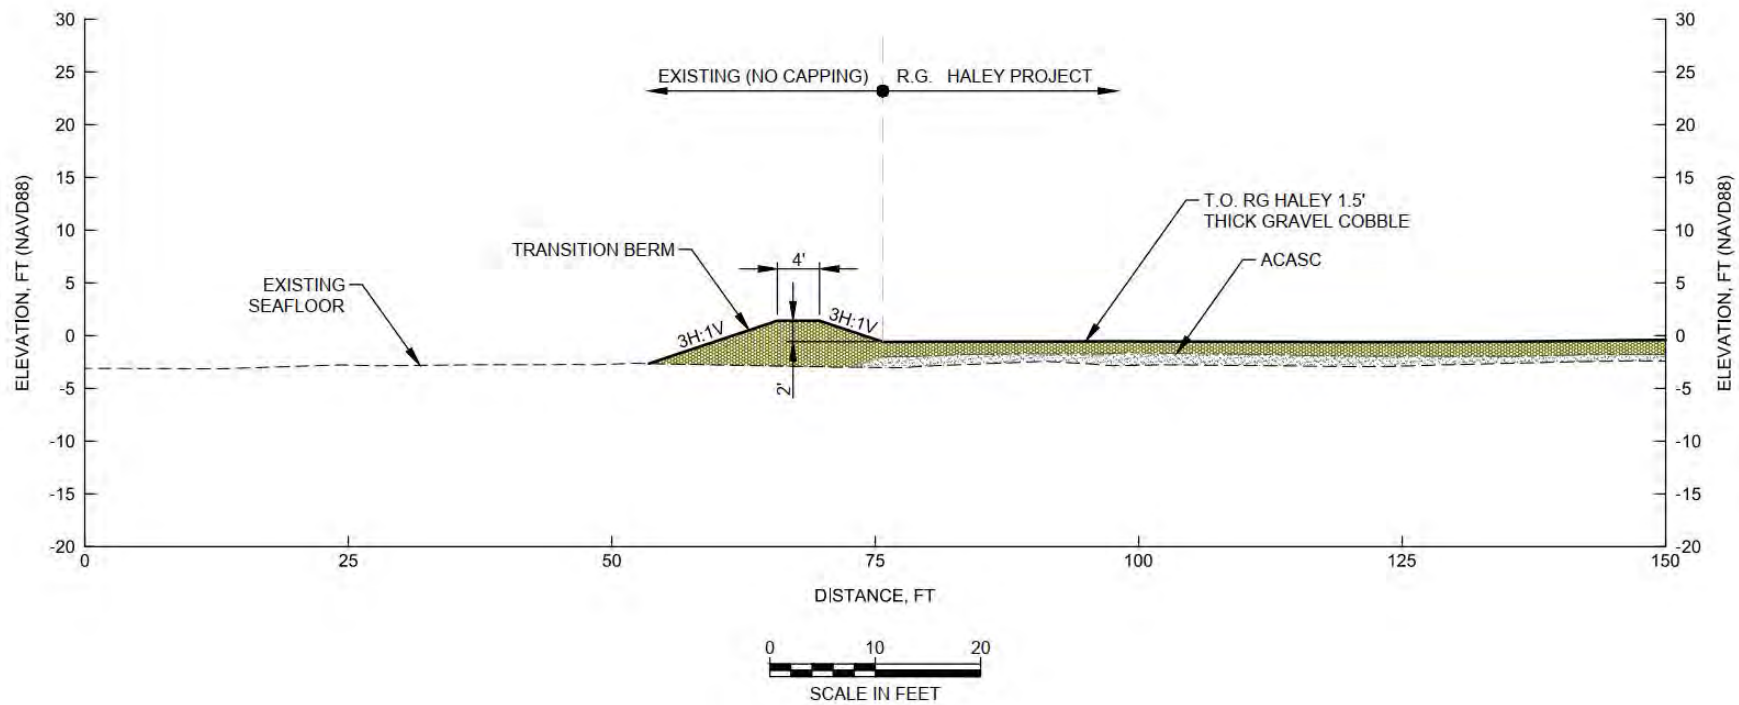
Transition transect - North transition of protection layers to existing bathymetry
